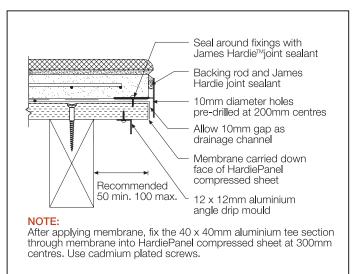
METHOD 1 - DECK EDGE DETAIL USING ALUMINIUM TEE SECTION
